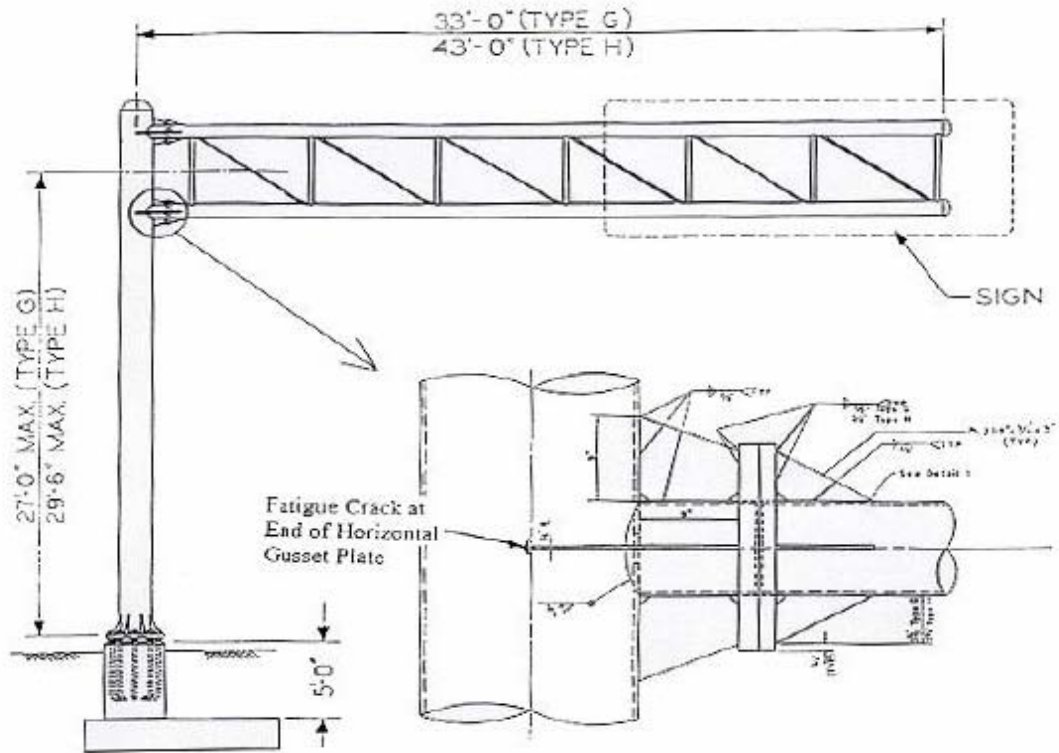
Details of Horizontal Gusset Plate to Vertical Pole Connection of Cantilever Sign Structure and Crack Location
